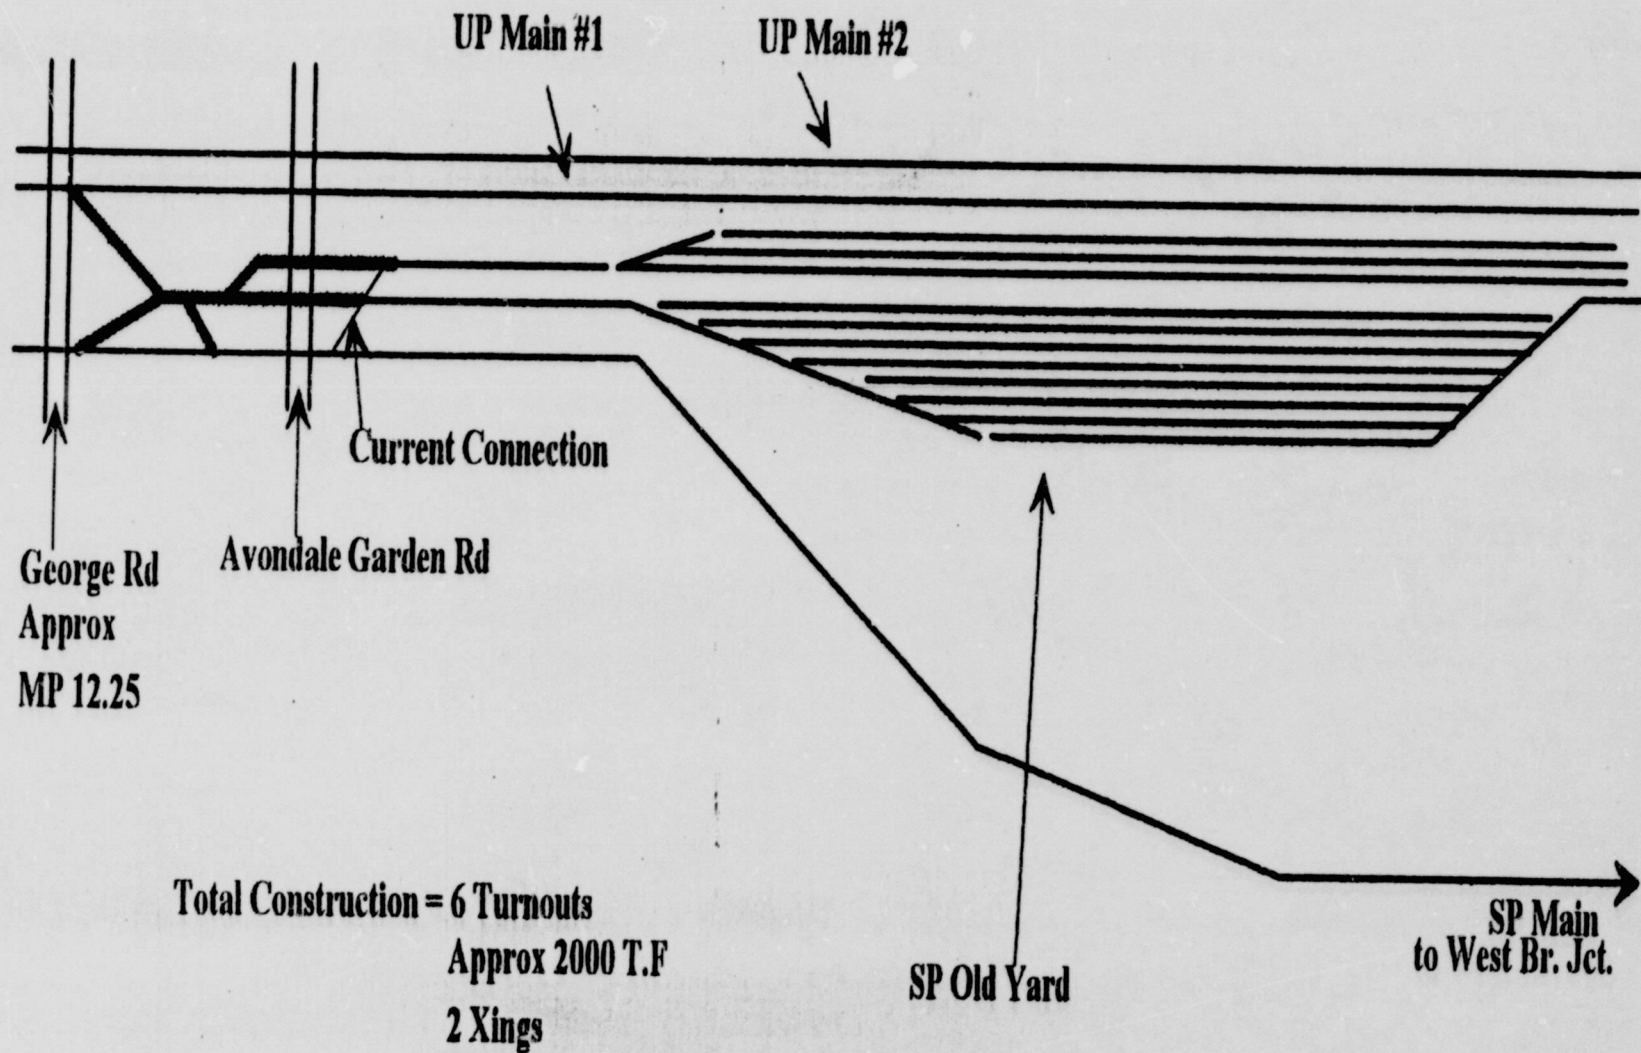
CONNECTIONS AT MP 14.5 AVONDALE, LA
